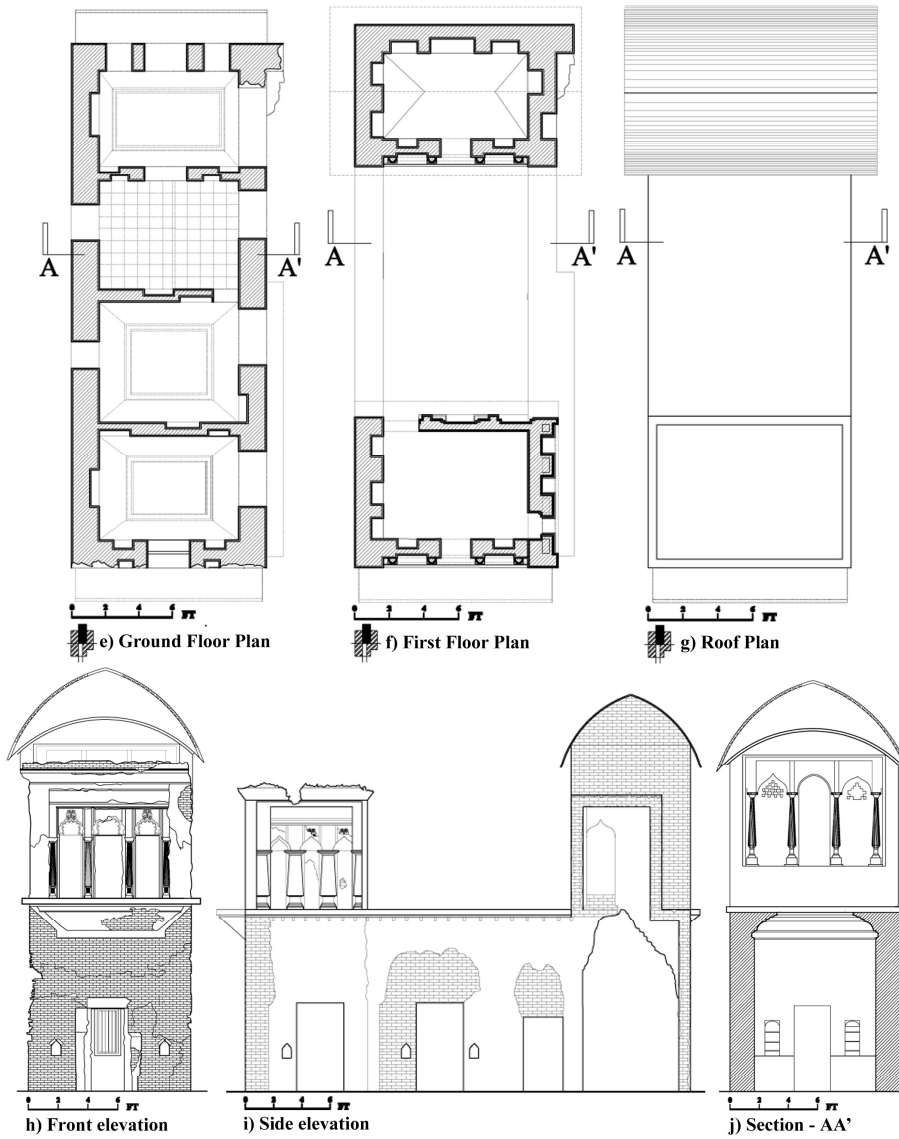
e) Ground floor plan, f) First floor plan, g) Roof plan, h) Front elevation, i) Side elevation, and j) Section-AA' of the building no. - 42.
